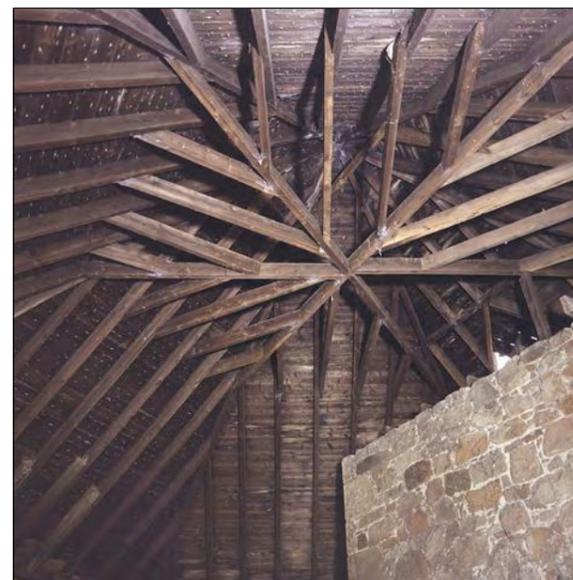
Interior roof detail of the Horse Engine House, with the Steam Engine House in the foreground.
